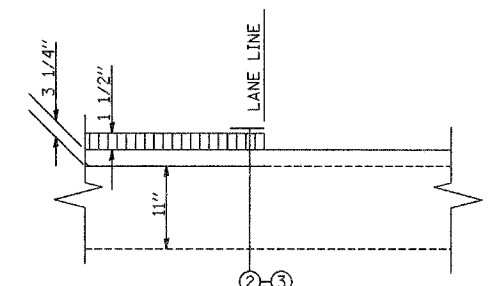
DETAIL E (EXISTING CONCRETE PAVEMENT AREA)
